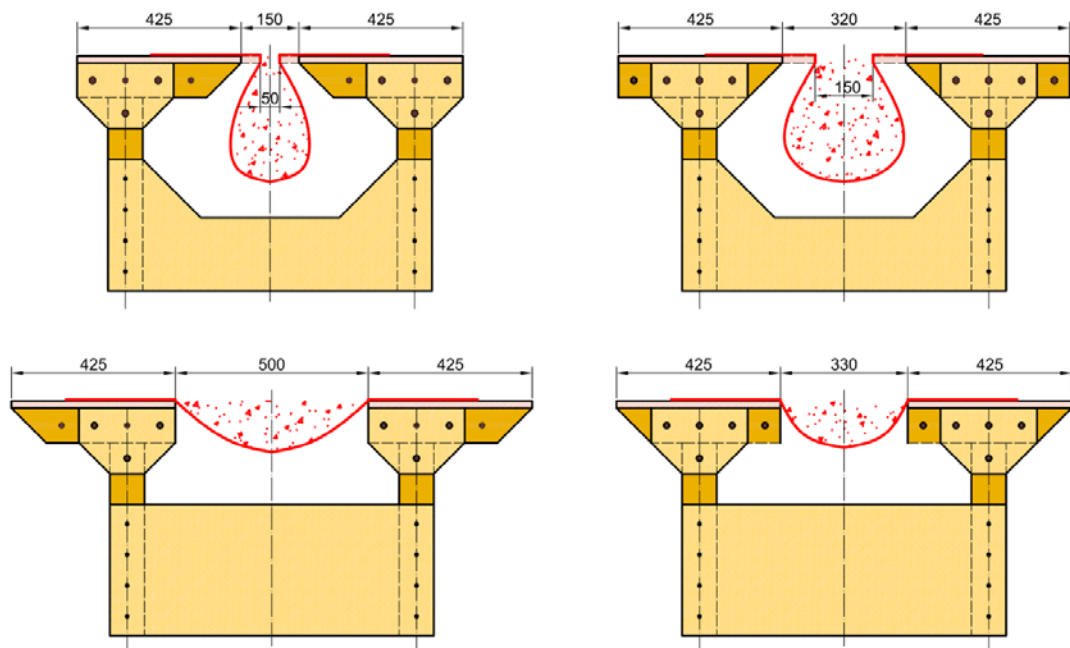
Maximum top opening for different arrangements of the transverse beams (all dimensions are in mm)
